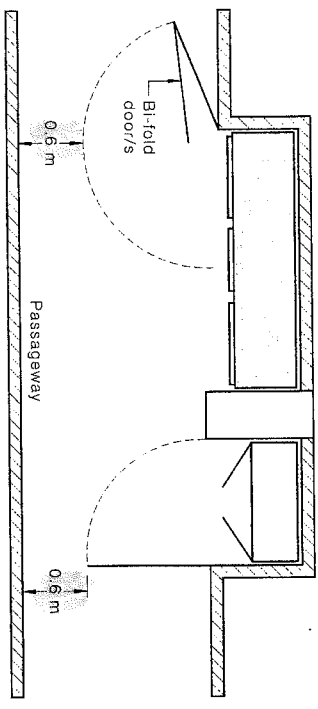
ACCESS TO SWITCHBOARDS— SWITCHBOARDS WITH DOORS THAT OPEN INTO ACCESSWAYS OR NARROW PASSAGEWAYS
